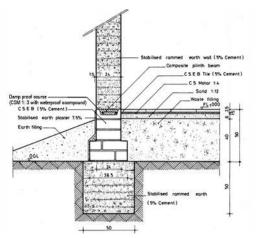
Stabilized Rimmed Earth Foundation (Auroville)
